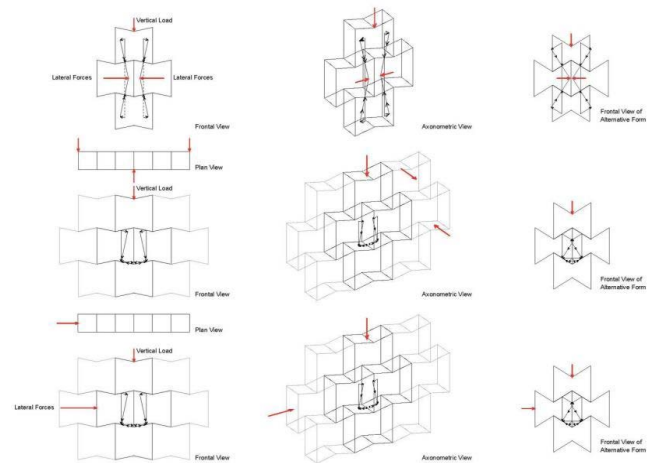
The connection details, Reviewed from: <http://www.architectmagazine.com/project-gallery/thermometric-facade>
